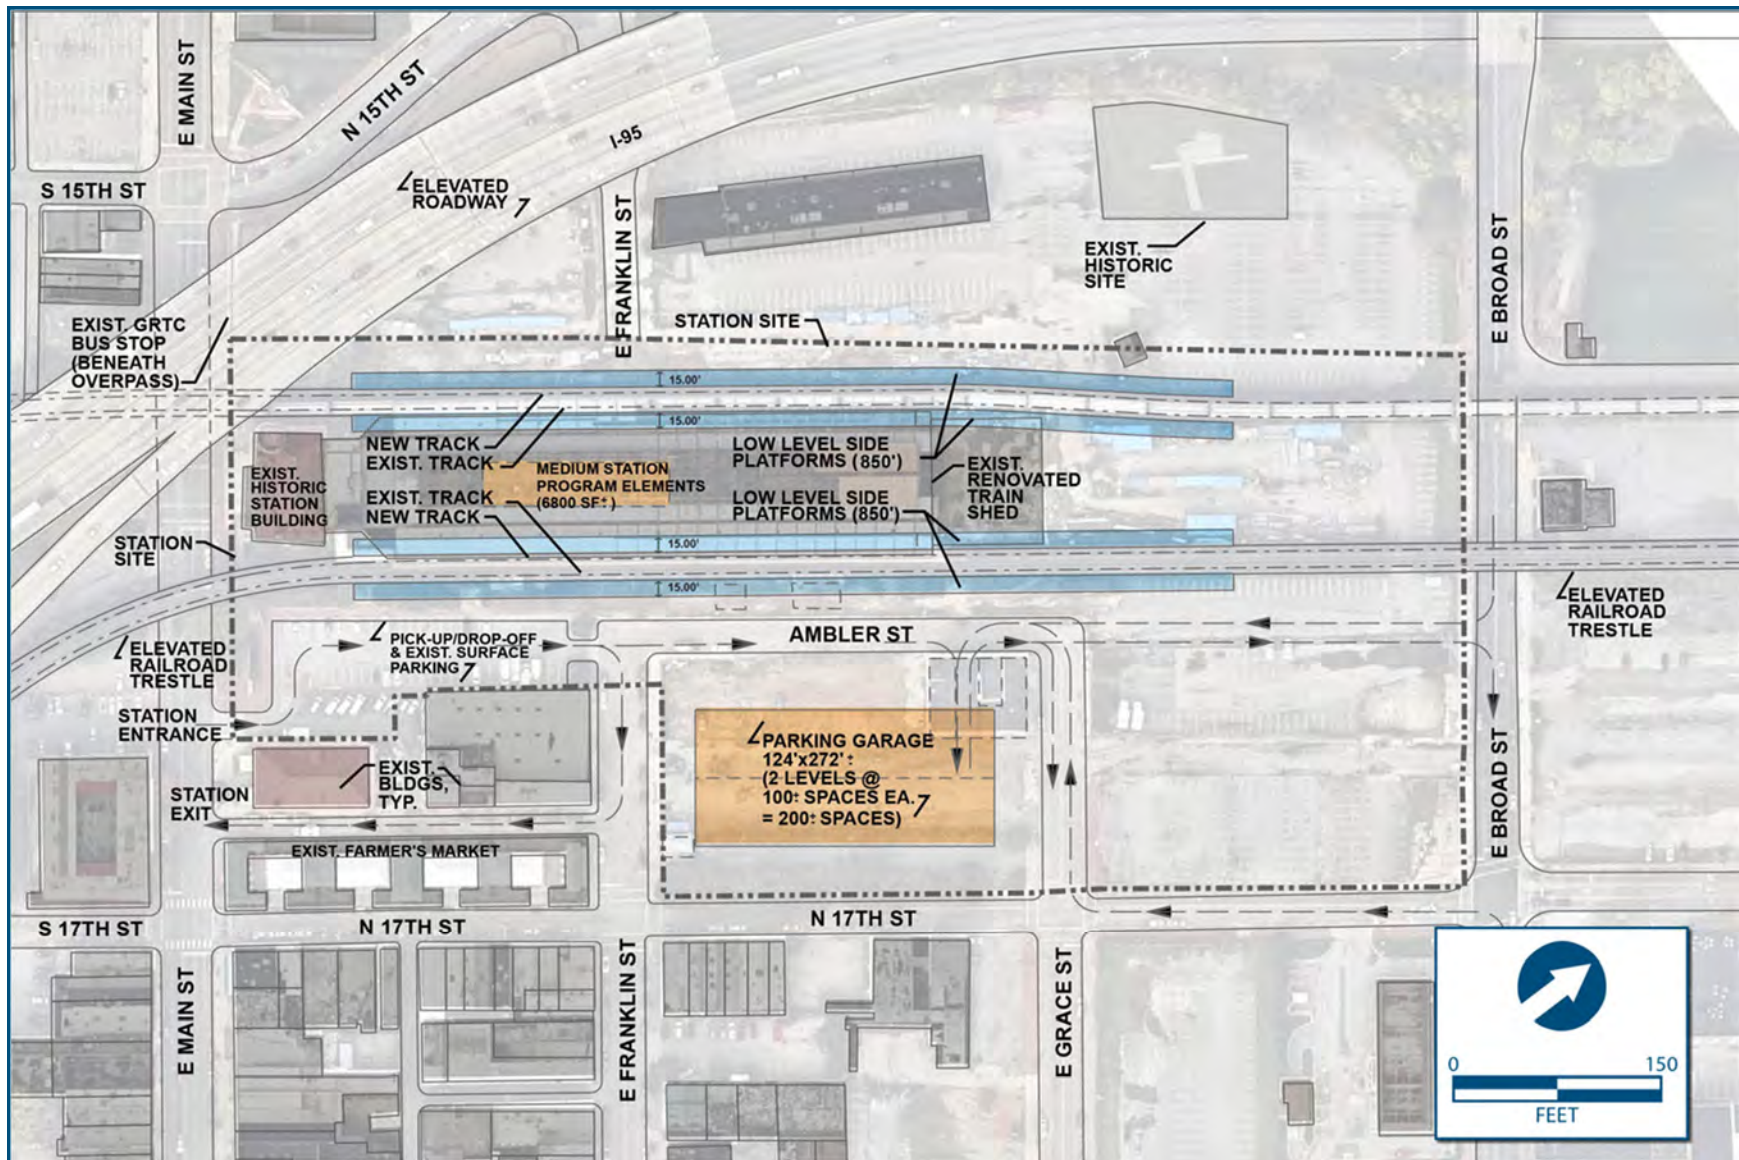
Main Street Station Improvements for Build Alternative 6G
